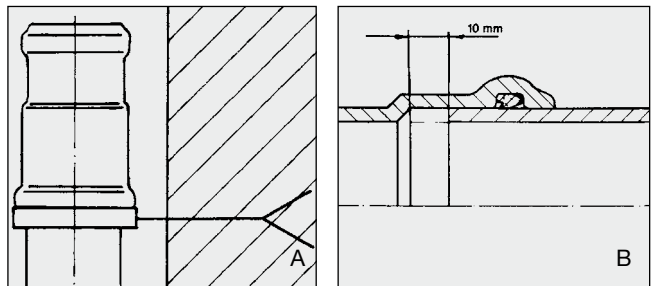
Joints with compensator socket (A) or alternatively with integrated socket (B)
